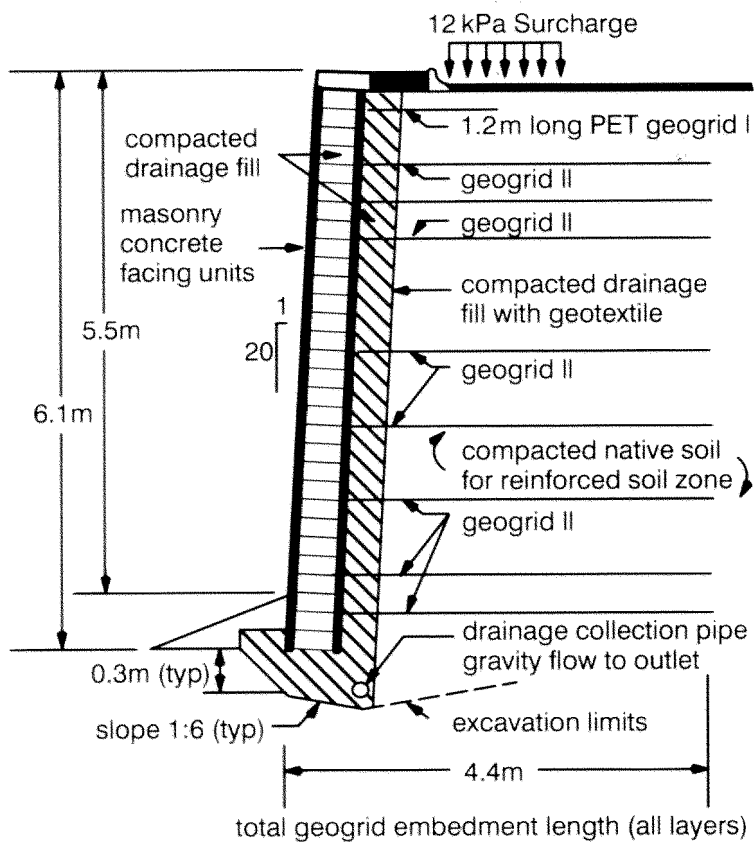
Typical geosynthetic reinforced soil segmental retaining wall cross-section (after Simac et al. 1991).
